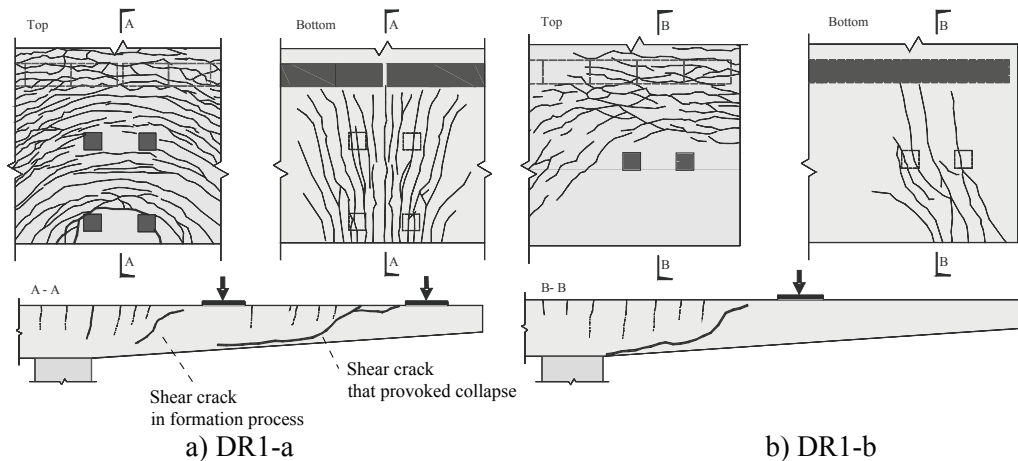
Crack pattern on the top and bottom surfaces for tests DR1-a and DR1-b
